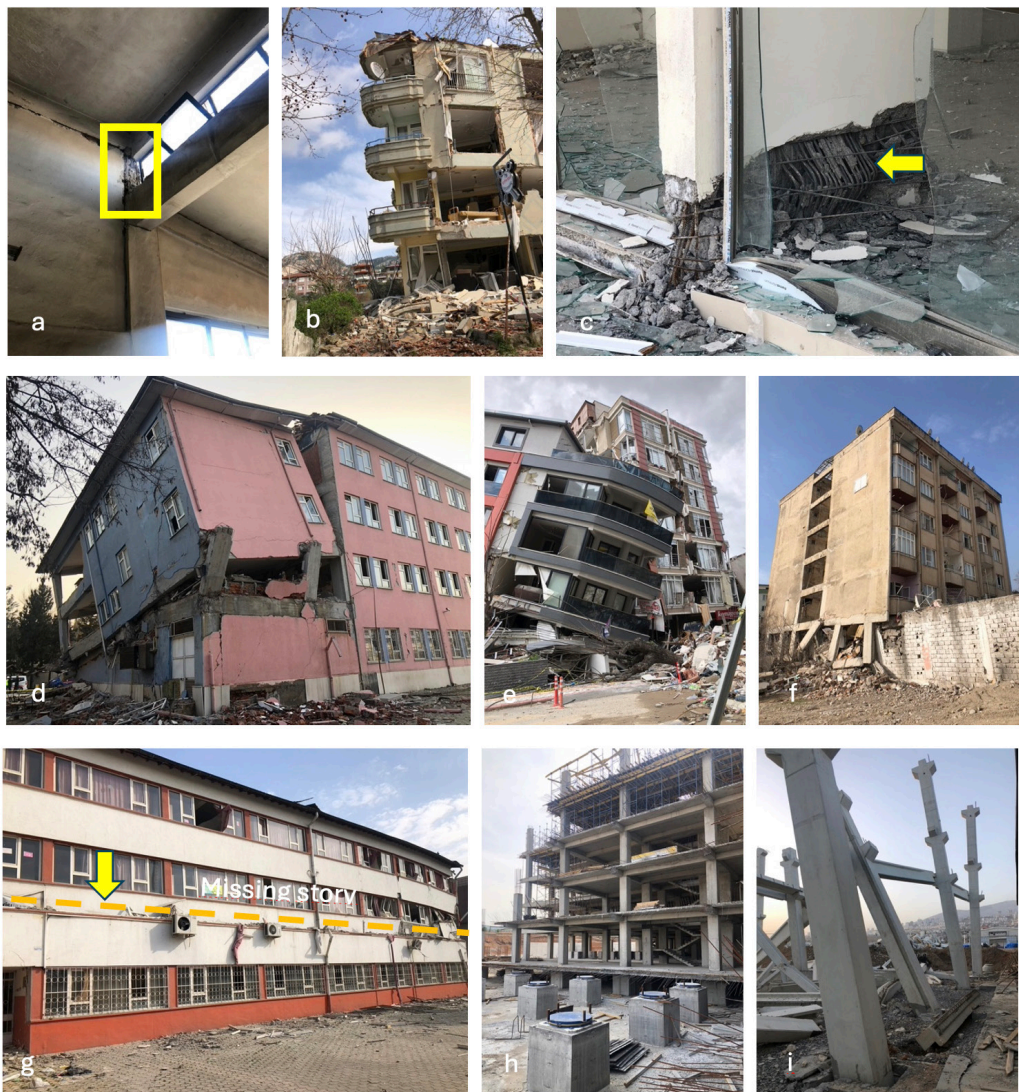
Structural damage to buildings a) Short column b) Flexible moment frames c) Shear wall failure (concrete crushing and rebar buckling) d) School building mid-story collapse e) Building collapse from irregularity f) Ground story collapse of sub-standard building g) Mid-story collapse in school building h) Hospital building with isolation devices (under construction) i) Totally collapsed prefabricated industrial building (under construction).
